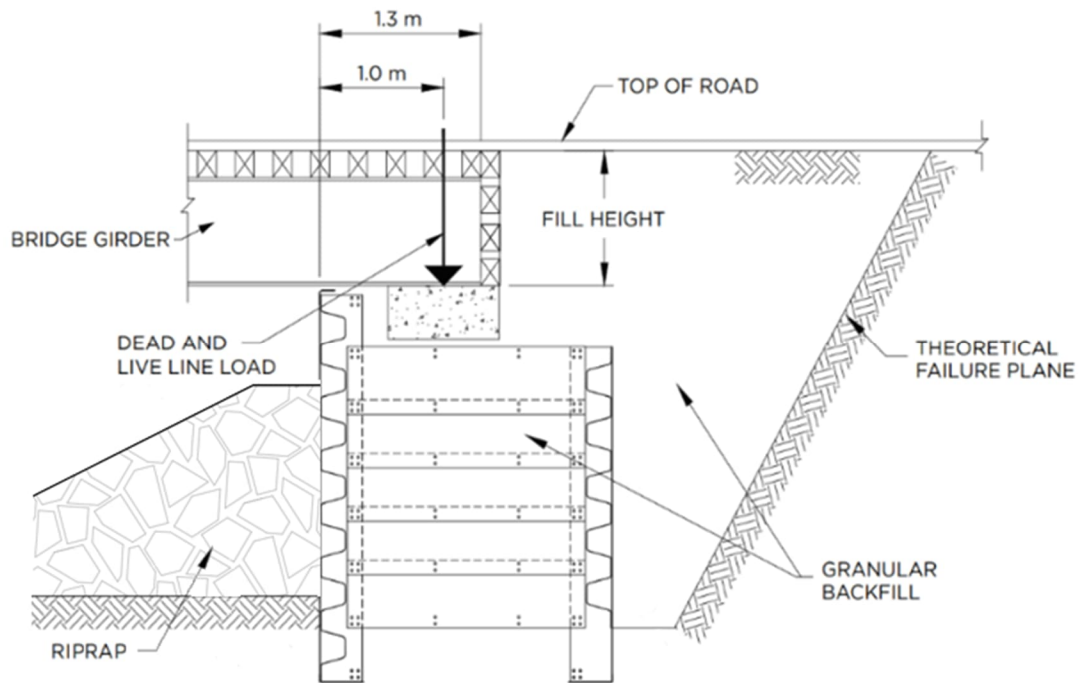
Cross-Section of the Binwall Abutment (Indicative)
